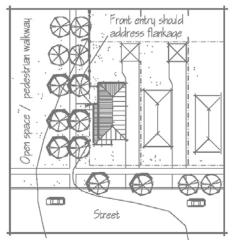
Example of Buildings Backing onto Open Space
